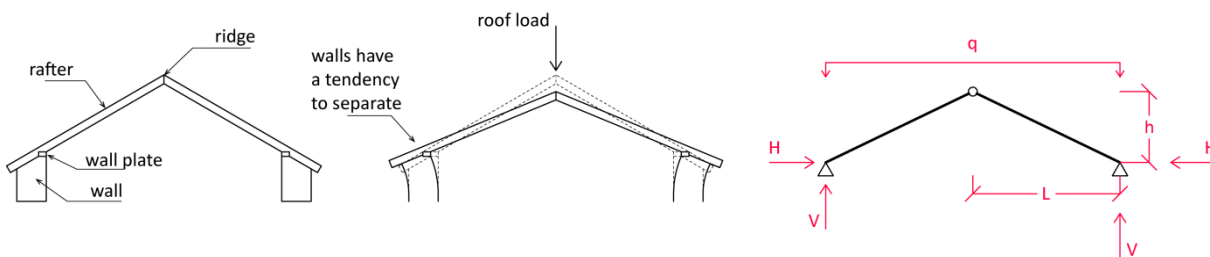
Common behavior of thrust exerting roofing structural systems under vertical loading
